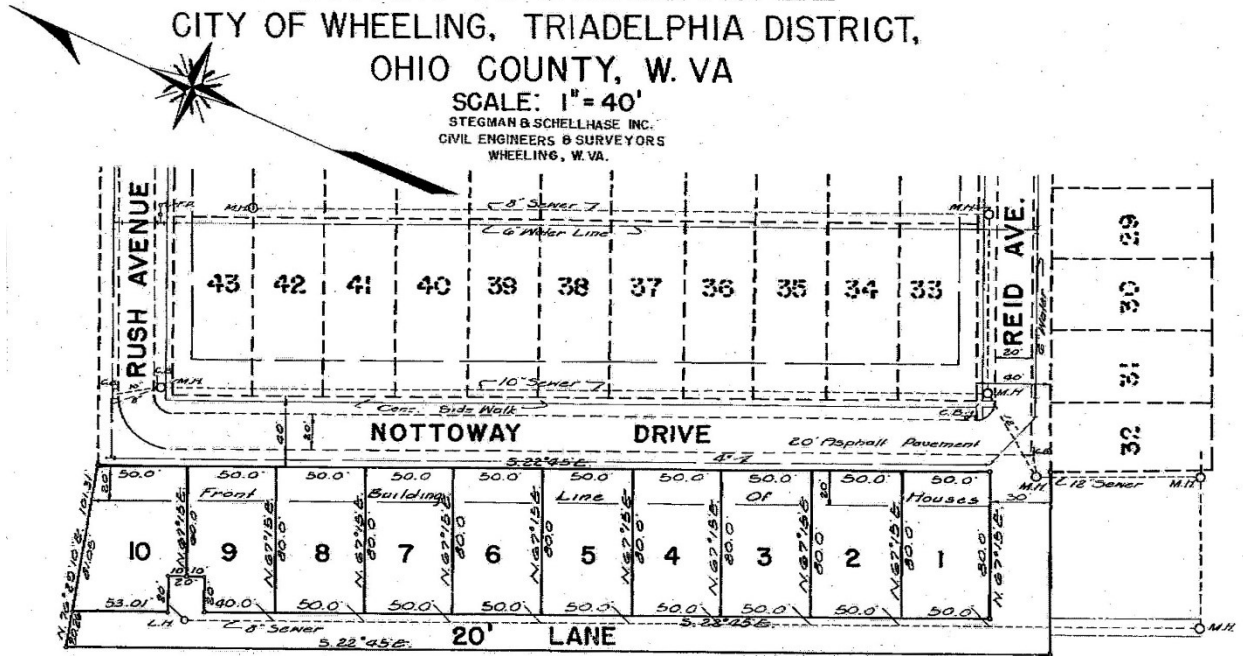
Hasdell Addition to Dimmeydale, 1956.
